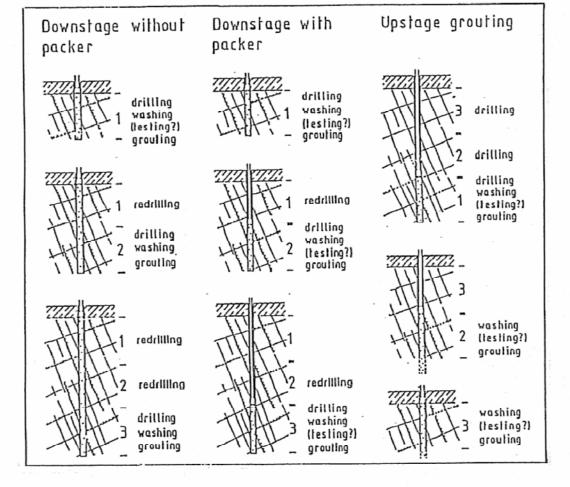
Conventional stage grouting methods for rock fissure grouting (After Ref. 2).
